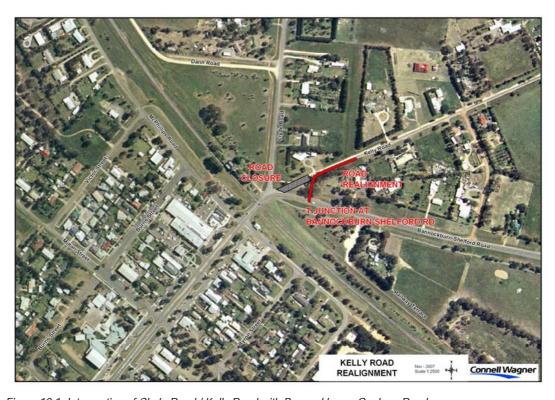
Intersection of Clyde Road / Kelly Road with Bannockburn – Geelong Road
